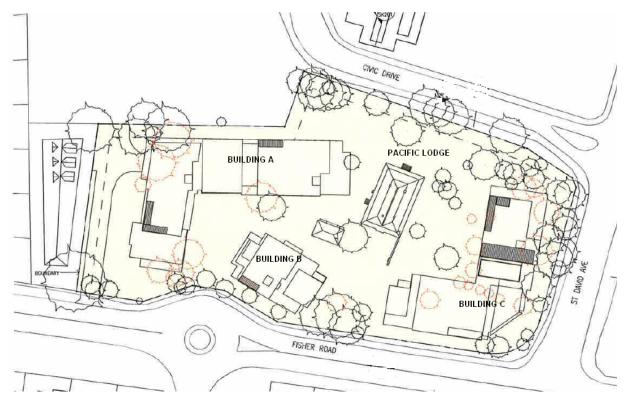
Building identification (Source: Plan No. SK-120 dated 11/10/2010 prepared by Hassell)
